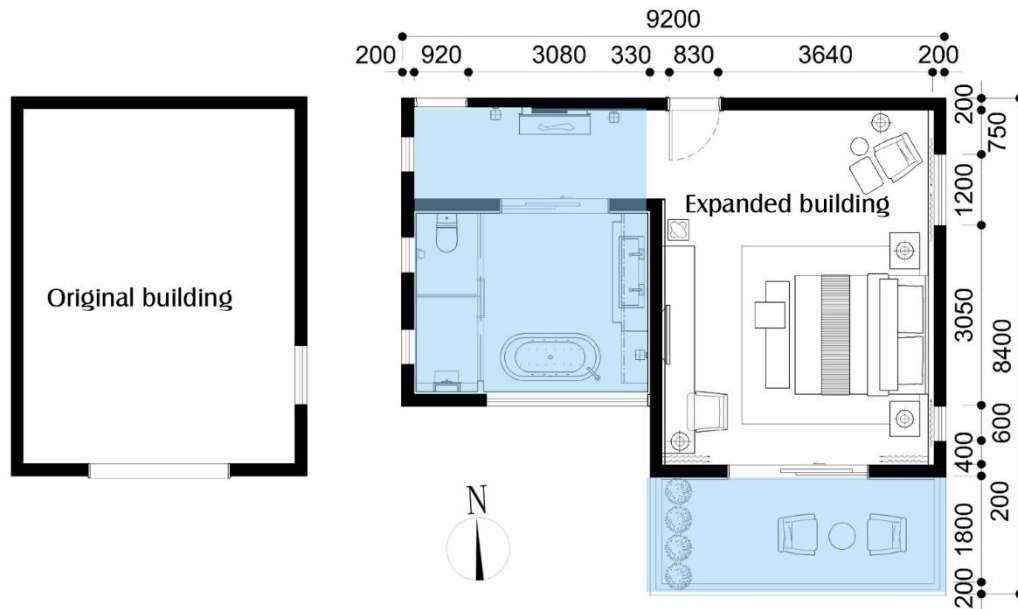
Senior Housing 3 Original and Expanded Floor Plan
